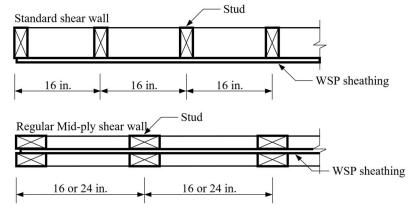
Cross-section of a standard shear wall (top) and a Midply (bottom) with single-layer of panel.
